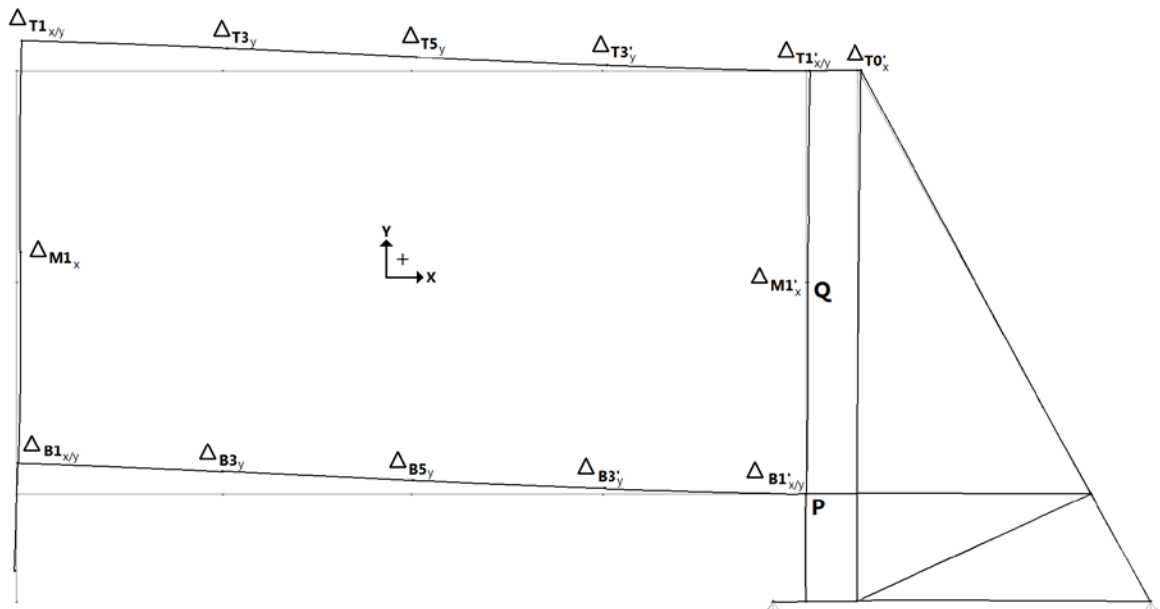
Deflected Shape of Concrete Frame under Vertical Racking
